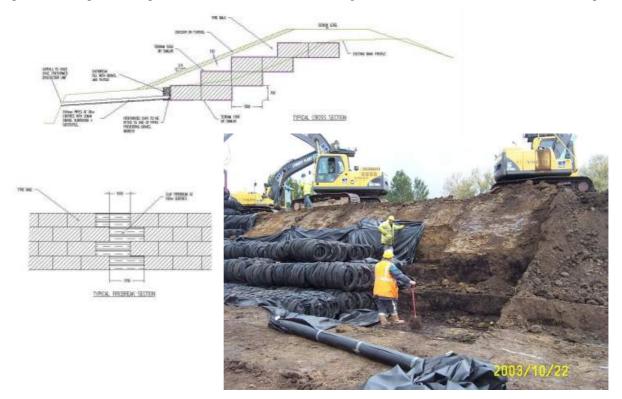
Design and construction of modification to flood embankment on River Witham using tyre bales.
